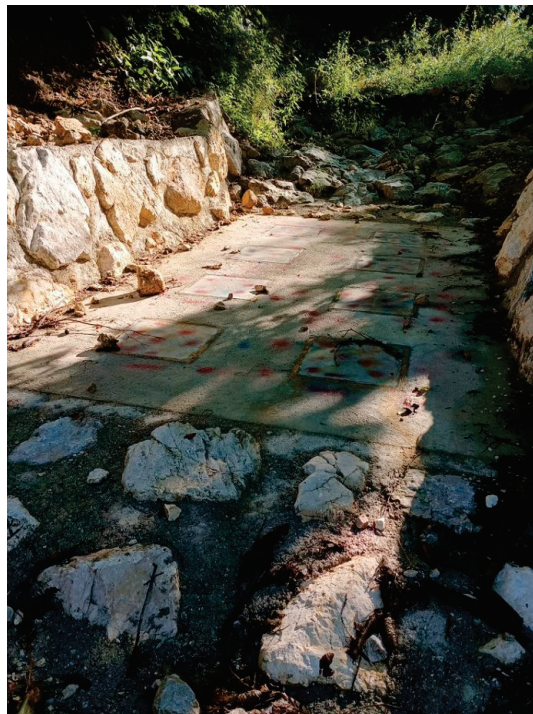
A field test site in the lower Brezovški graben for monitoring concrete abrasion—an upstream view.
